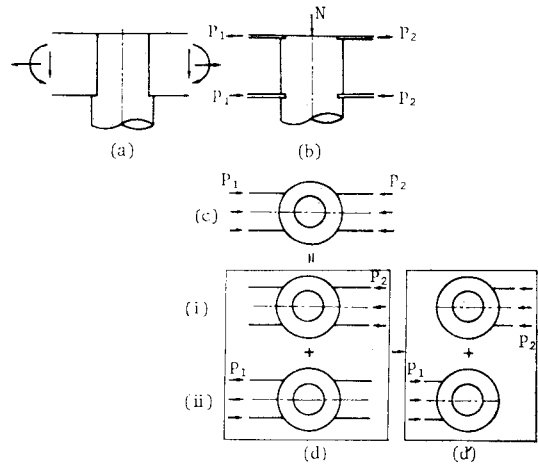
Cylindrical Pier Joined at Both Sides with Cross Beam
